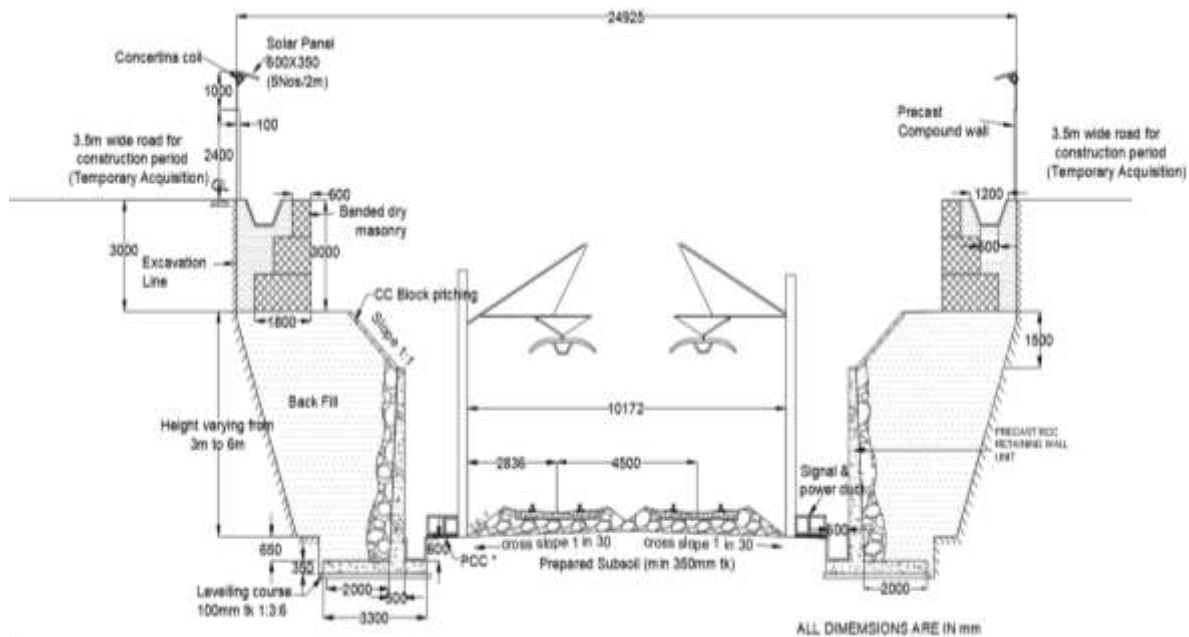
Typical arrangement with RCC R/Wall and Gabion wall at top 3m (6-9m)
